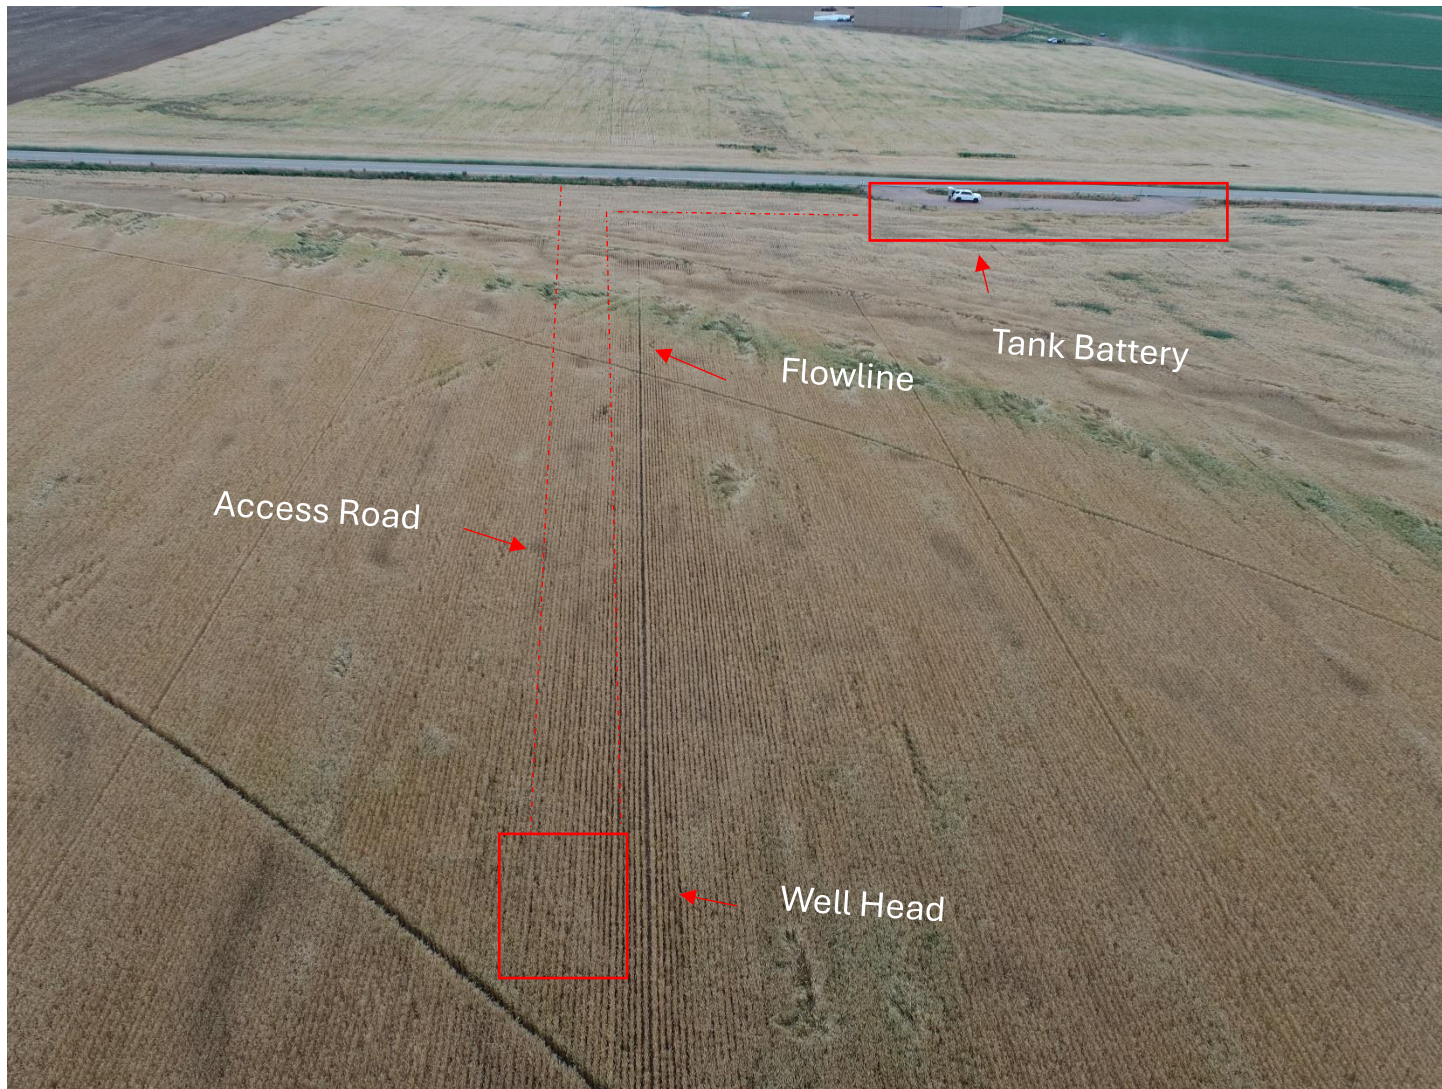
Looking East towards well, access road, and flowline, 120 feet in height: Lat/Long: 40.394487/-104.909653.
